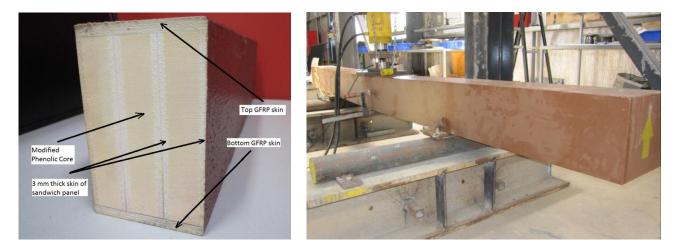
Hybrid glue-laminated fibre composite sandwich beam.
